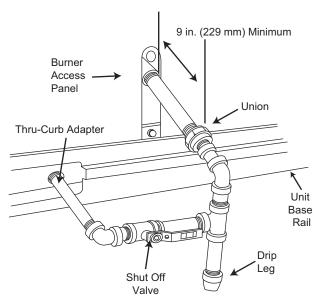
Gas Piping, Typical Curb Sidewall Piping (Example 2)
